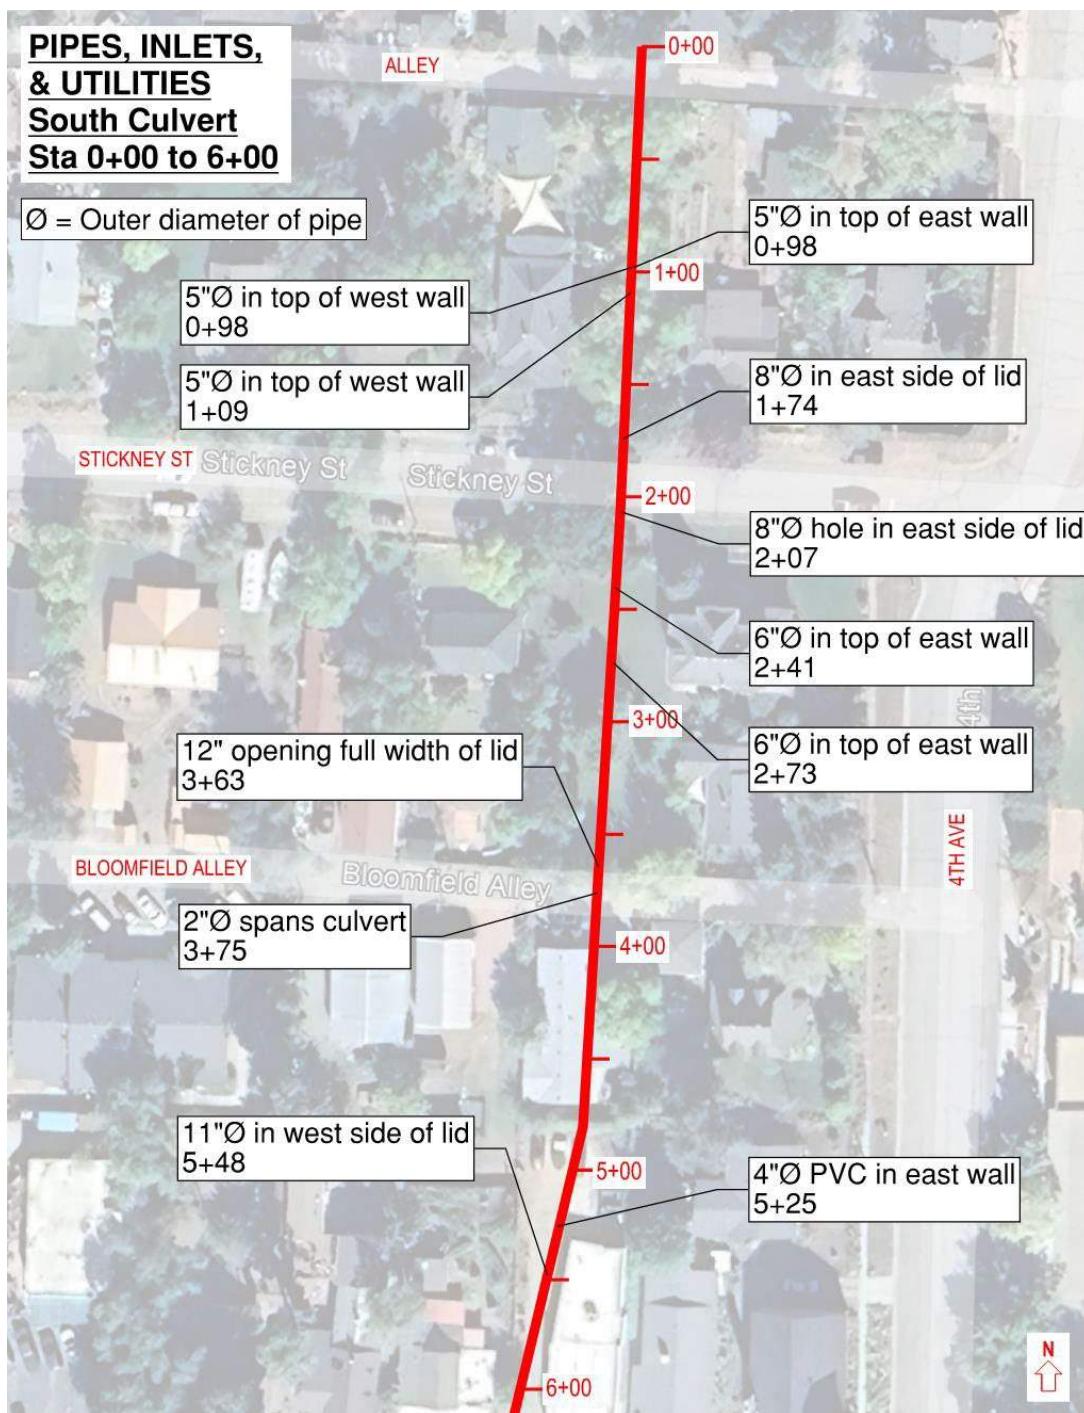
South Culvert Incoming Pipes, Utilities, Inlets Stations (S)0+00 to (S)6+00
